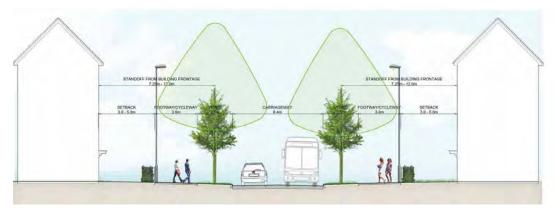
Tree Planting Section showing tree planting within 7.25m-12m from building frontages
